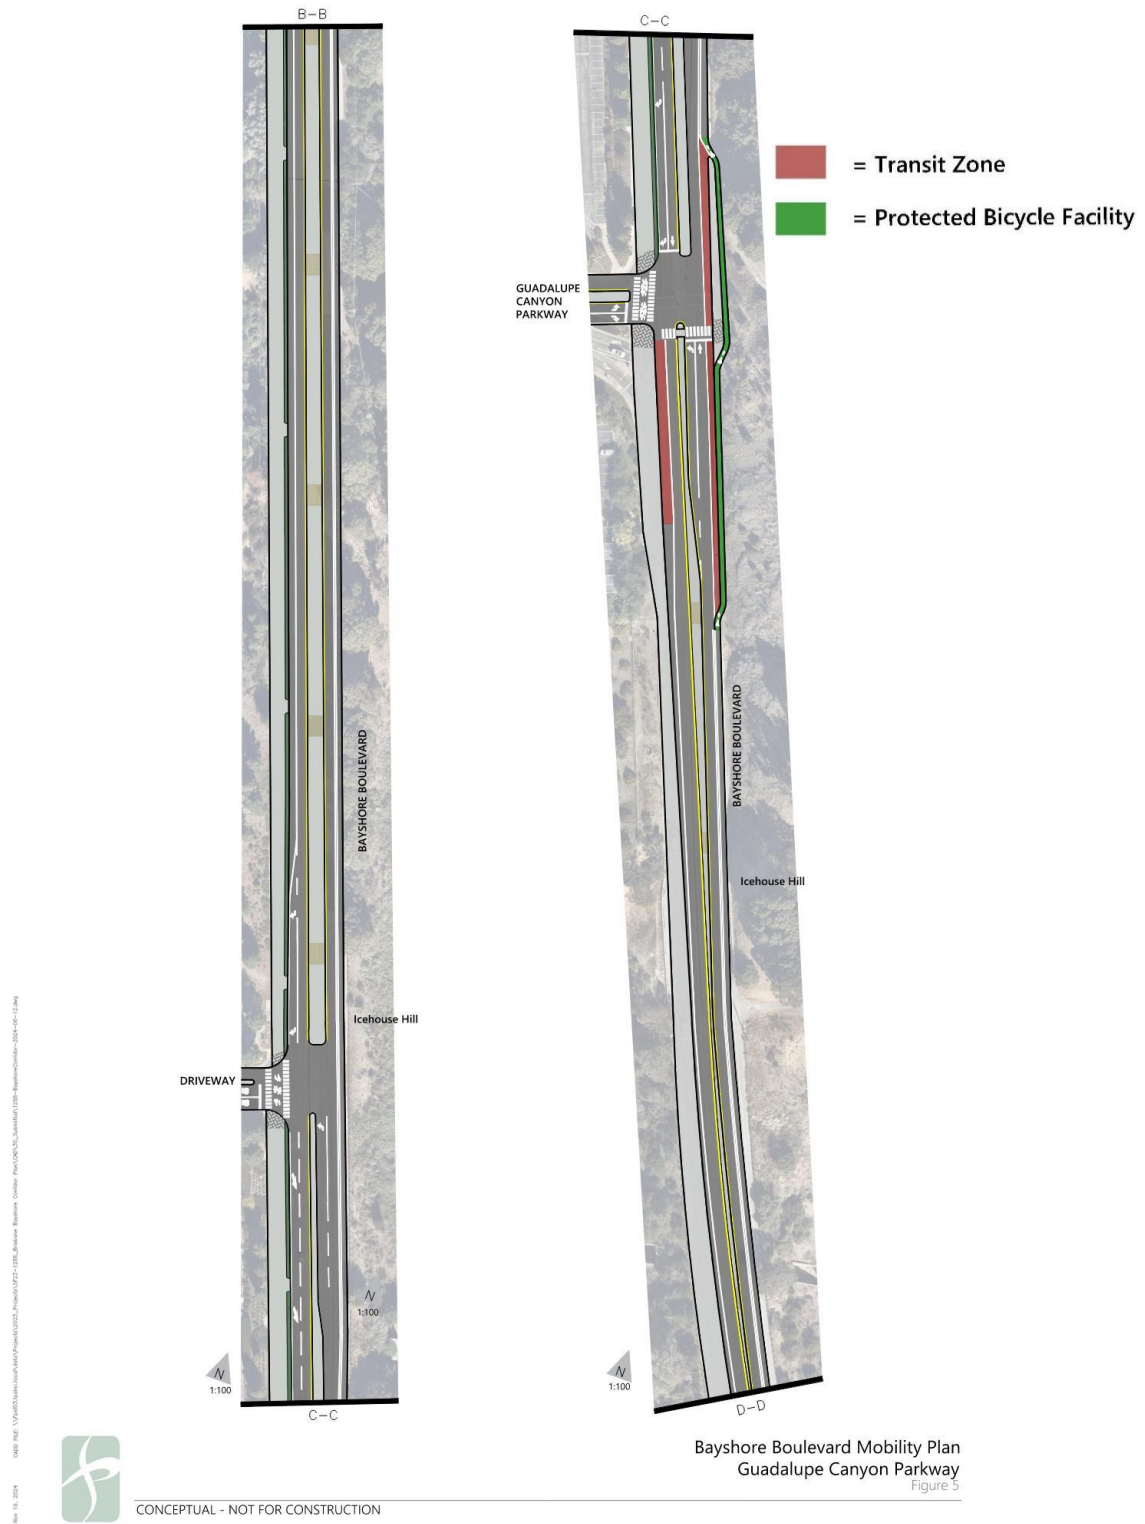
Bayshore Mobility Plan – Brisbane Technology Park to Guadalupe Canyon Parkway
